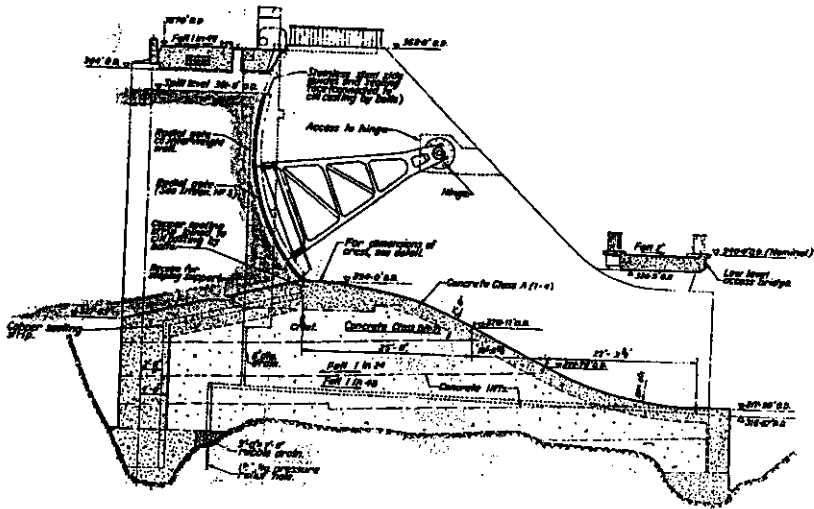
Dundreggan Dam : Cross Section through radial gate
